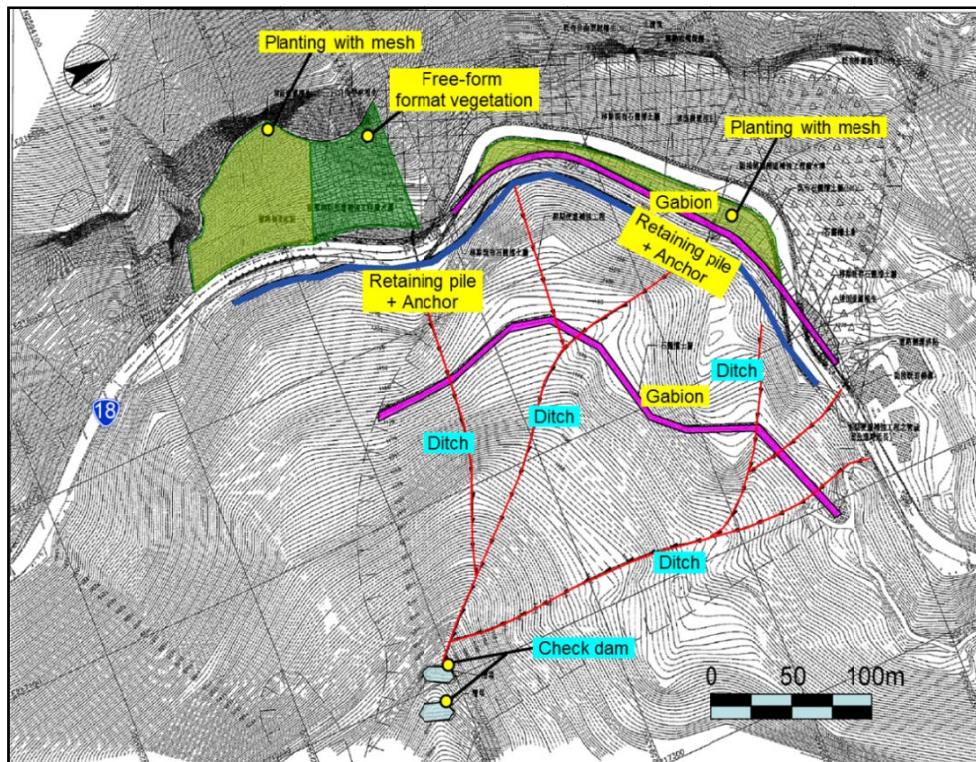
Layout of repair works at Mileage 59.1k of Alishan Route 18
